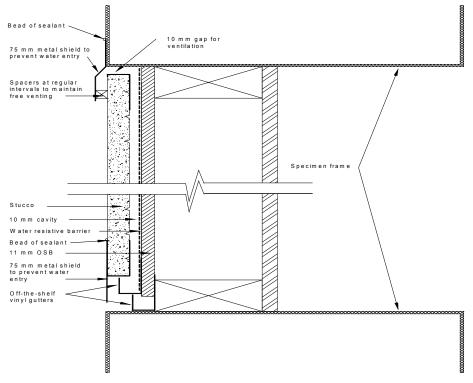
Termination detail for specimen No. 5 - Vertical section
